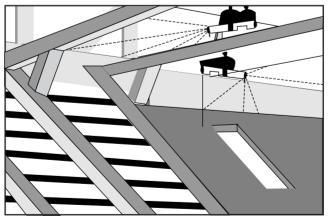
The laser beam is used to provide easy and accurate location markings on pitches and in hard-to-reach situations. (*Courtesy of Stabila*)
